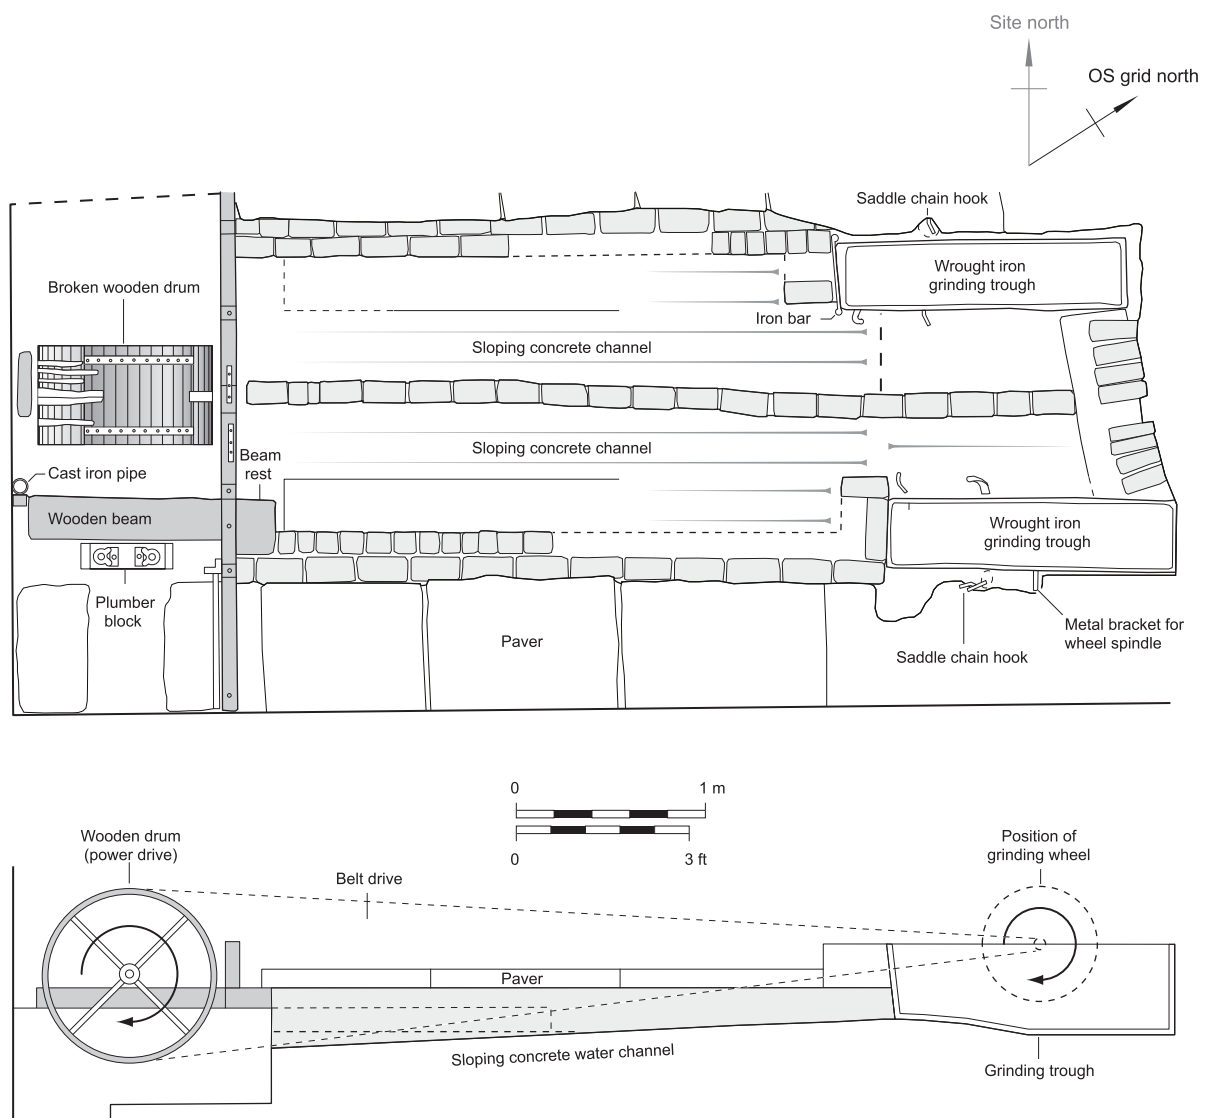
Plan and reconstruction section through first floor grinding trough, West range
